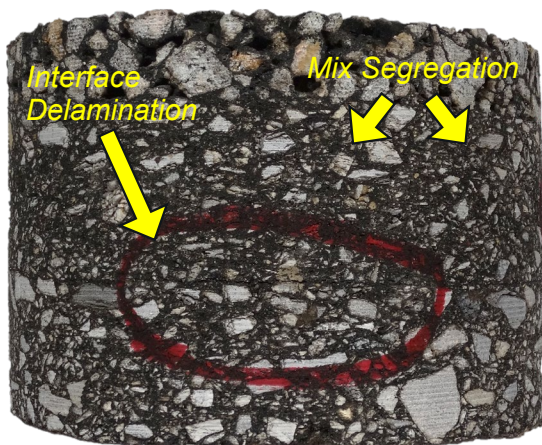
SR 79 MP 0.321 Worm Section Core – Structural AC Layer Delamination and Segregation
